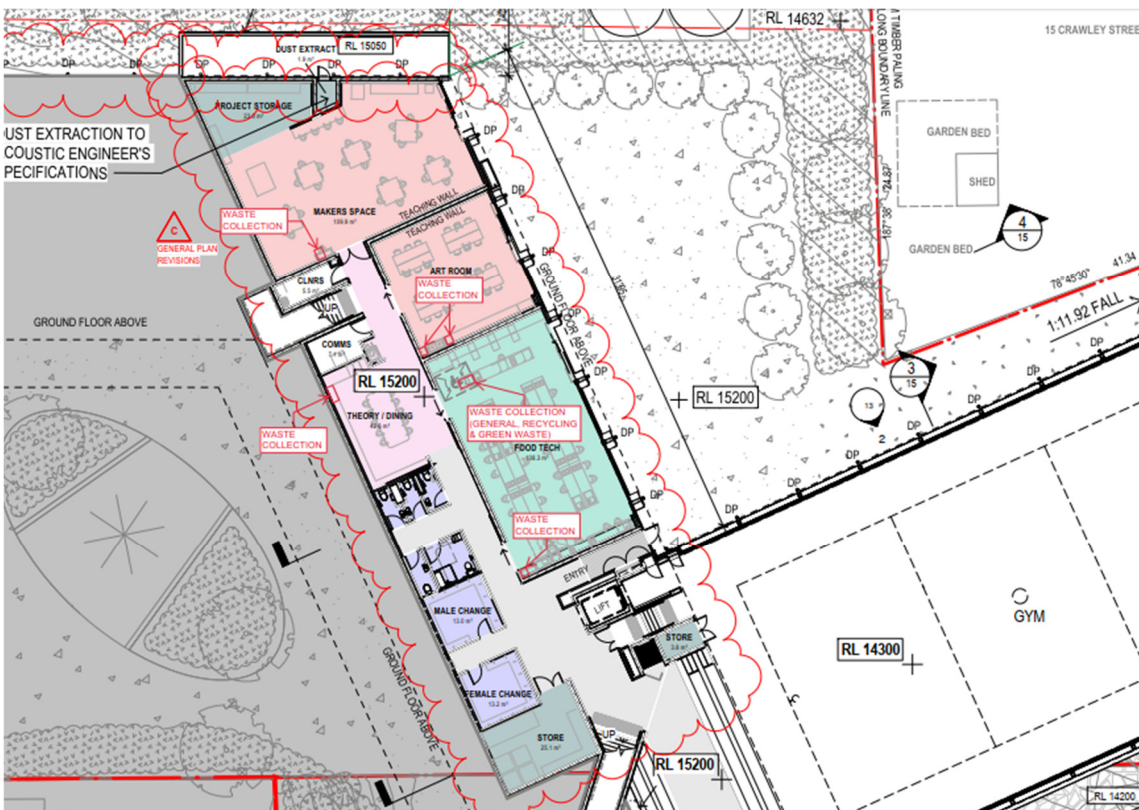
Internal waste collection points, lower ground floor, architectural drawings
